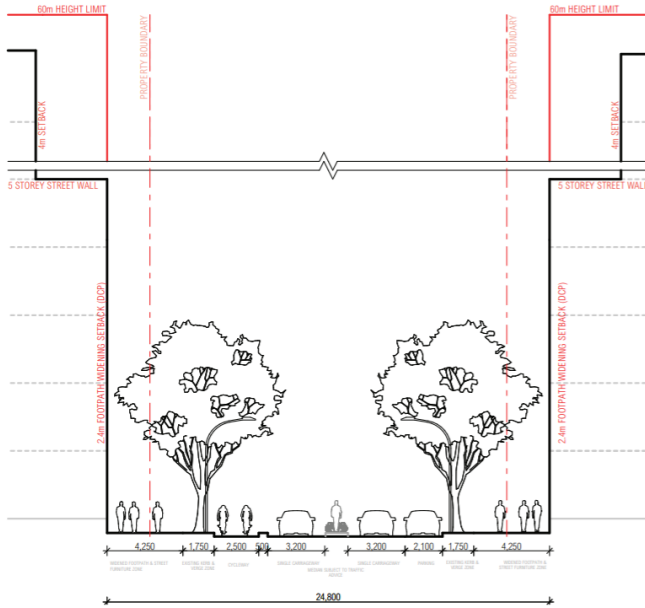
Indicative street section – Typical Internal Lane, Commercial Block, North Alexandria
